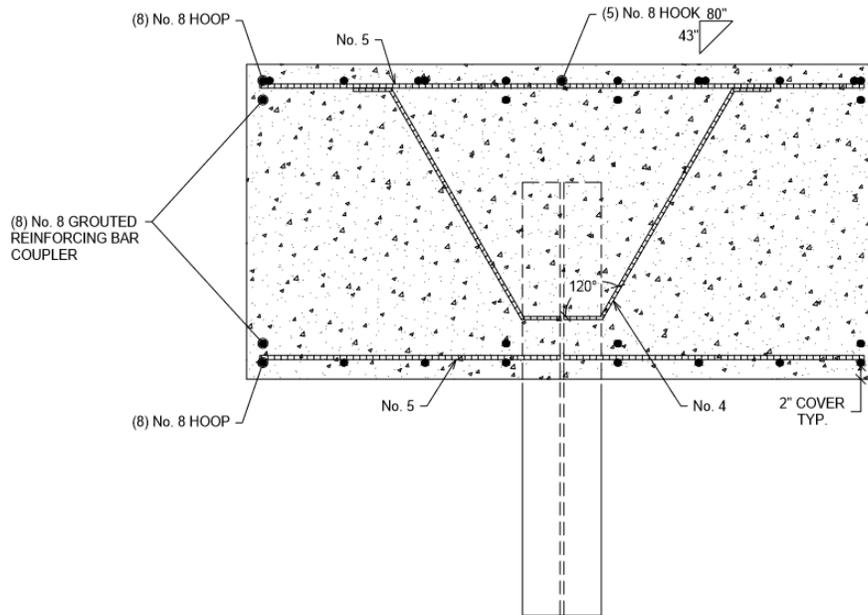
Plan view of GRBC specimen showing locations of couplers.
